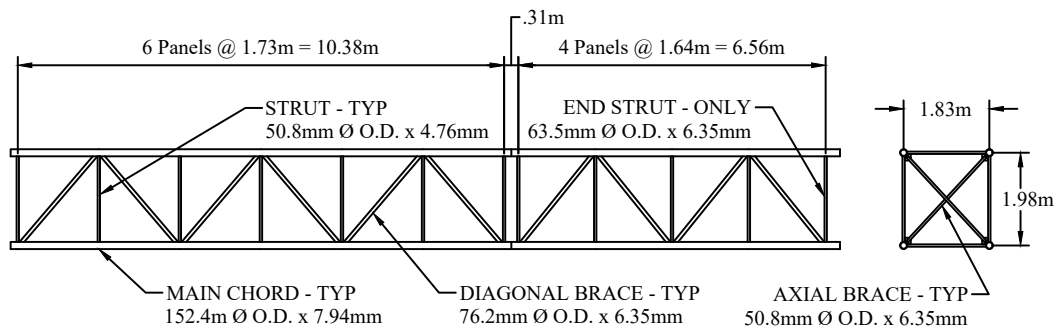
Plan view of 3D truss with dimensions and cross-section details
